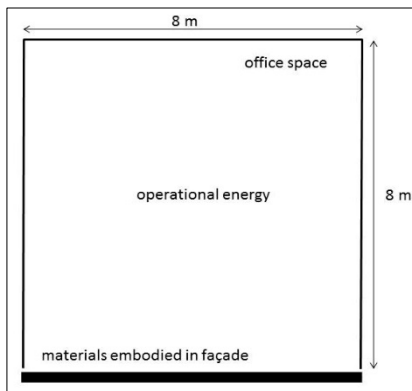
and 6. Floor plan and section of the investigated simulated south facing office space.
